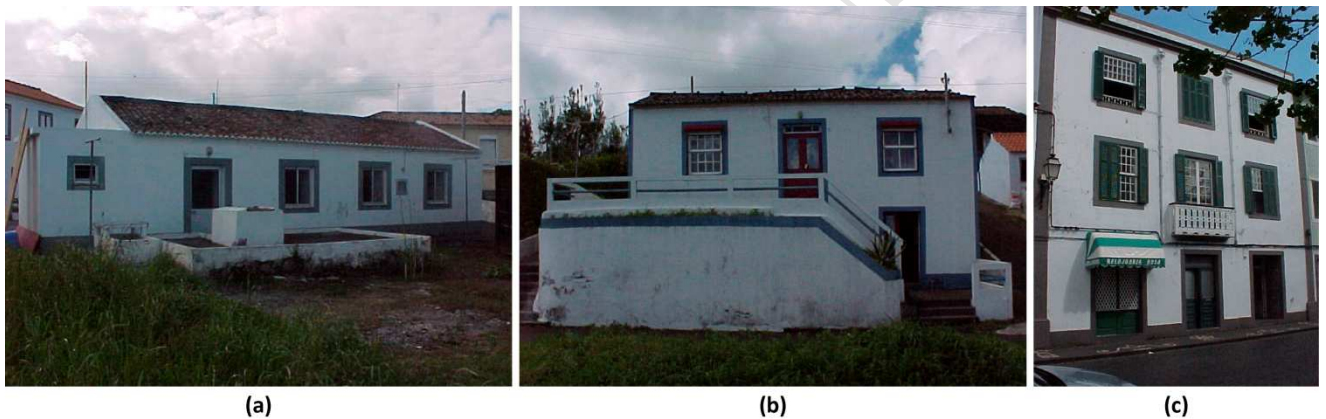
Examples of typical traditional Azorean masonry construction types in the island of Faial present in the selection: (a) one-floor rural building; (b) two-floor rural building; and (c) three-floor urban building
